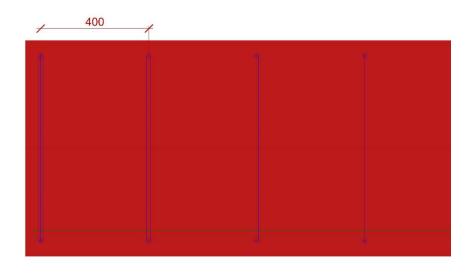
Longitudinal section of the deck beam, zoomed in, displaying the spacing of the stirrups
